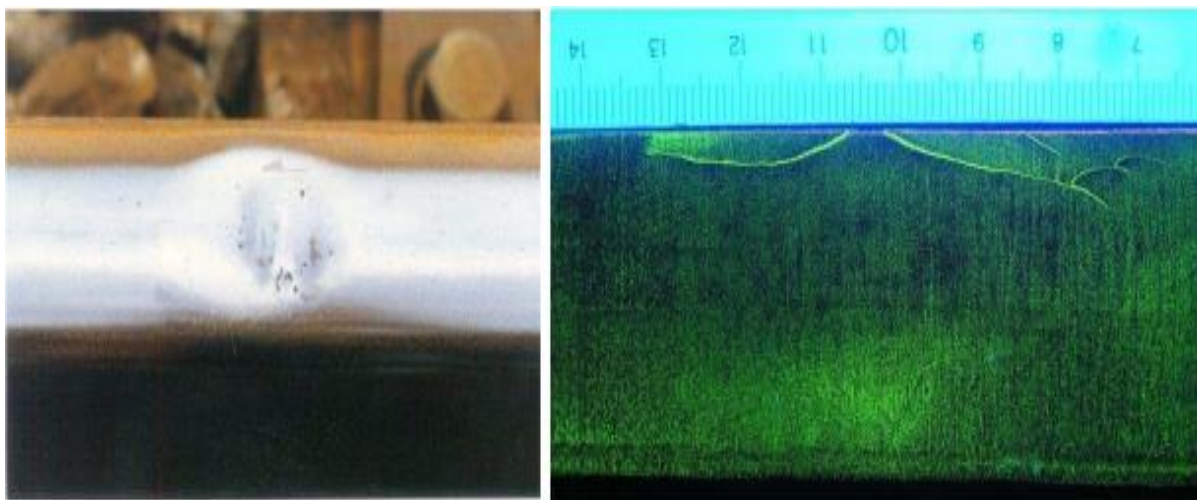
2: The cross-section squat type crack with the long leading crack (in rolling direction) and the much longer trailing crack in the opposite direction (Magel, E. 2011).
